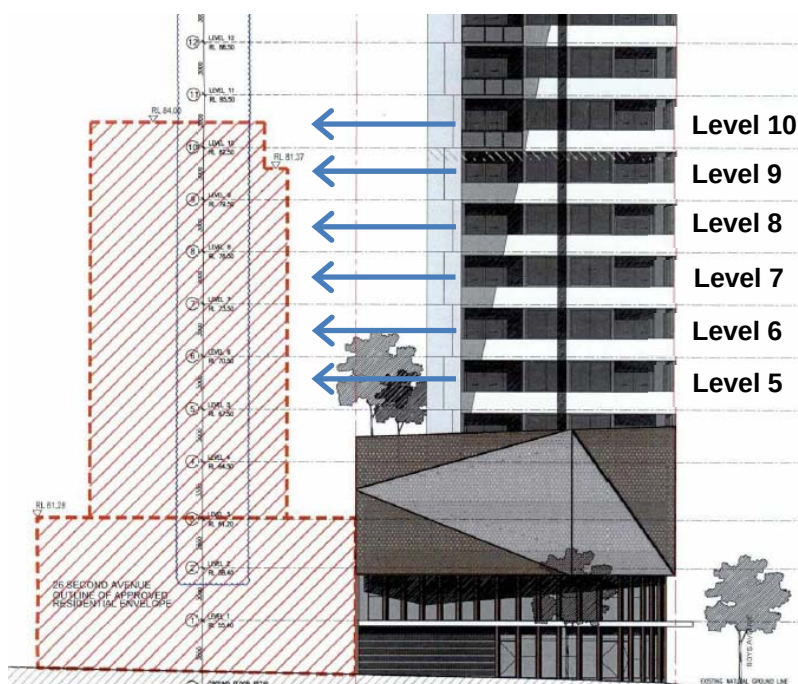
Extract from the approved North Elevation plan showing the relationship between the development at 28 Second Avenue and the building envelope approved in DA-13-01143 on the subject site.
